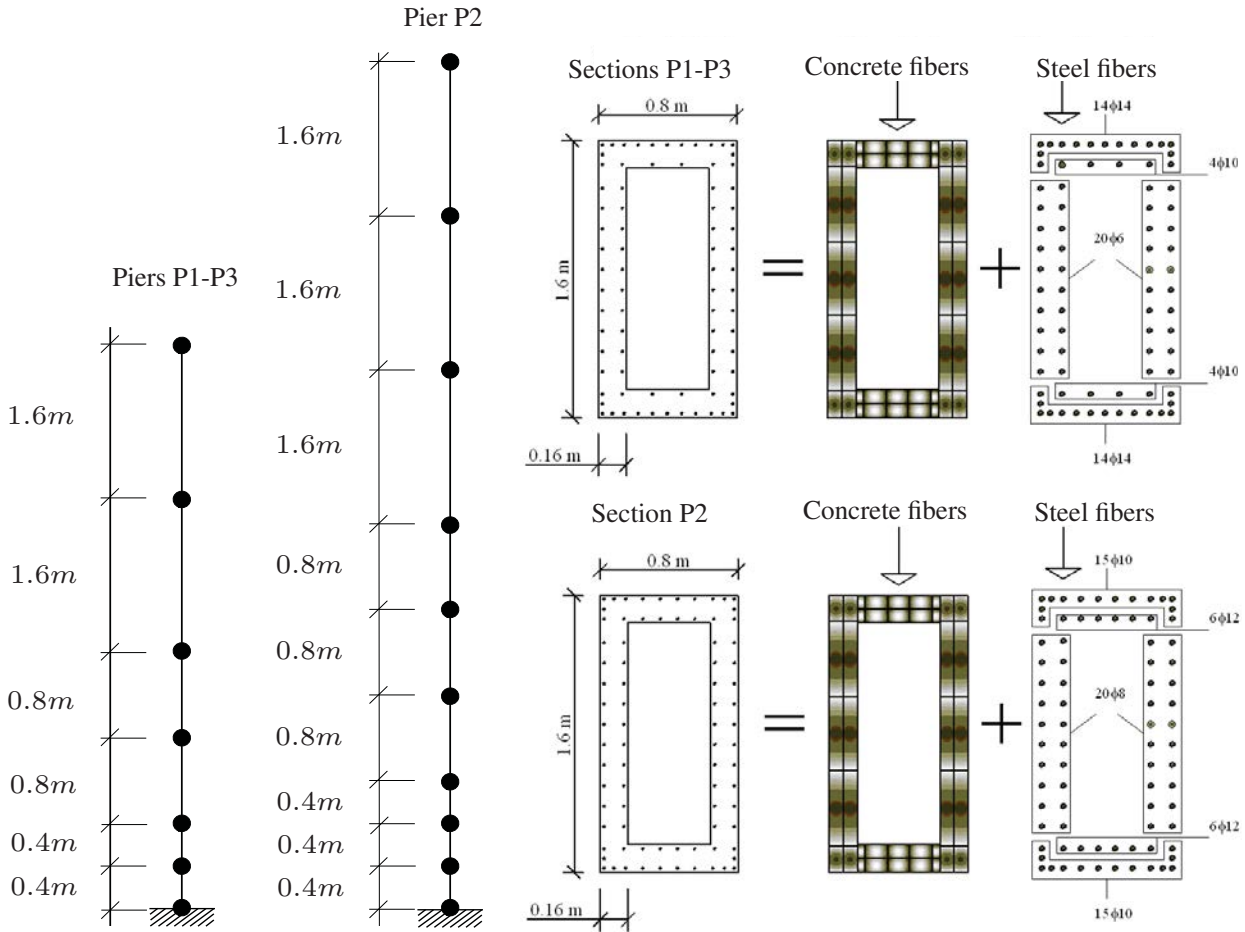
Viaduct: details of the multifiber beam element mesh (piers P1, P2 et P3).
